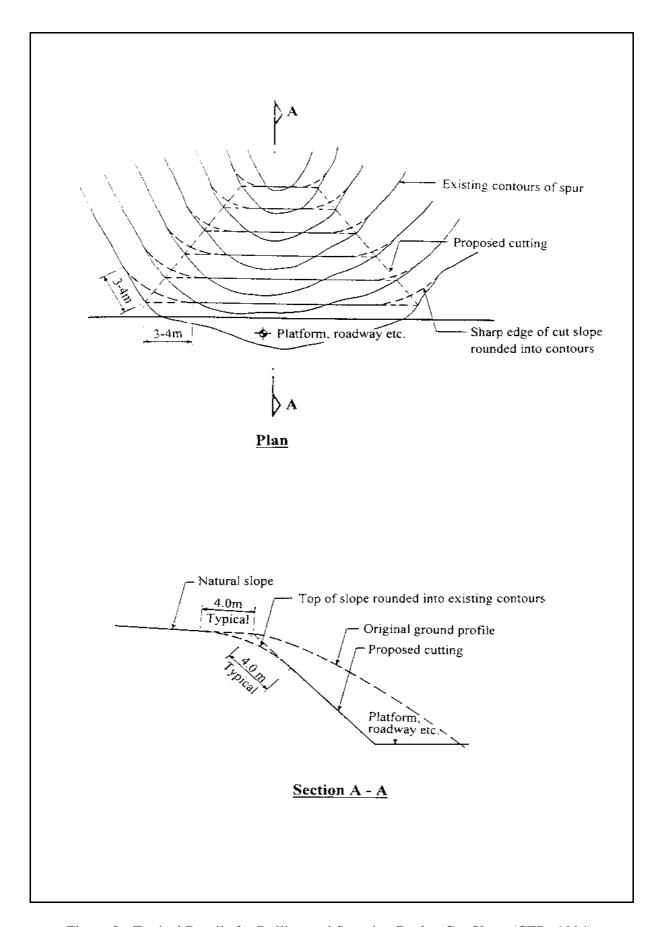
Typical Details for Rolling and Stepping Back a Cut Slope (CED, 1994)
